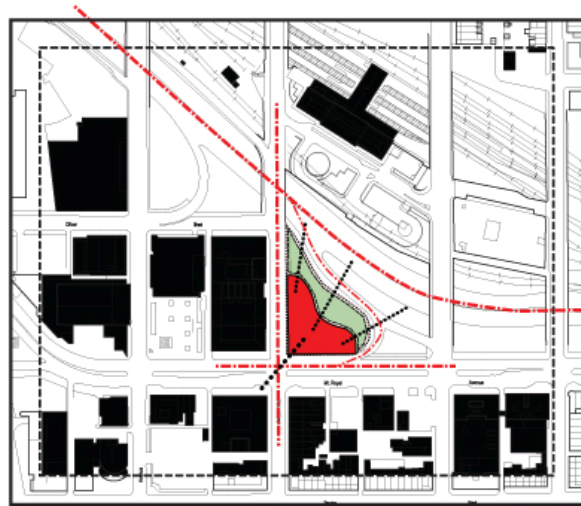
Site C site plan showing context images and site section cuts (source: author and Google Earth)
